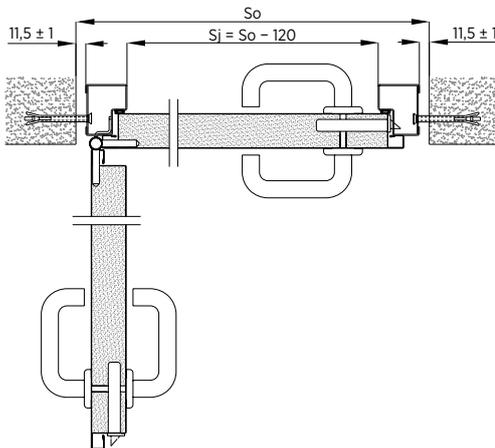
Installation of the single-leaf door with an internal frame, horizontal cross-section
